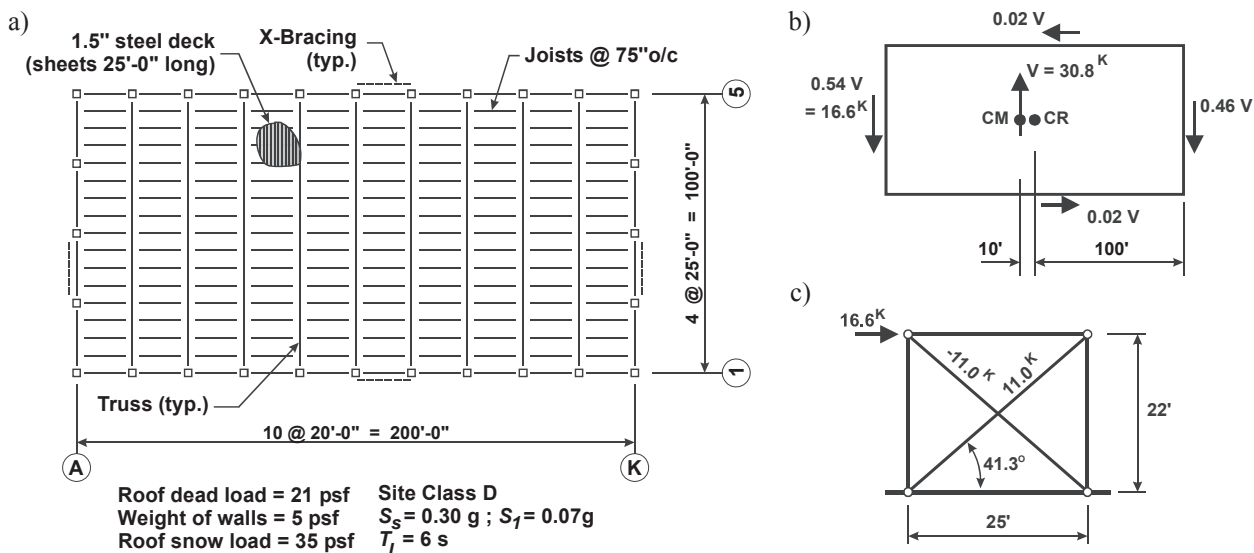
(a) Plan view of the building studied, (b) in-plane torsion effects, and (c) bracing bent studied.
